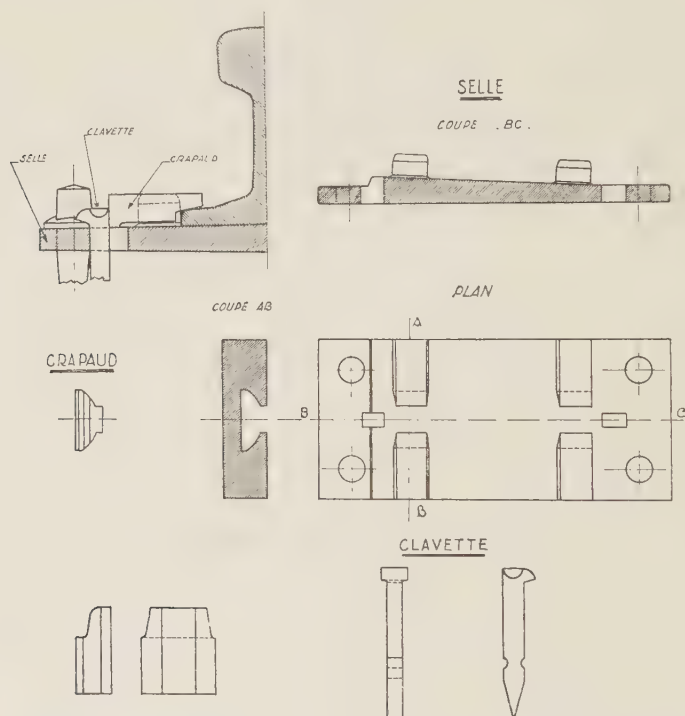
Laid on metal bearing plate with indirect fastening to the sleeper — Norway.
